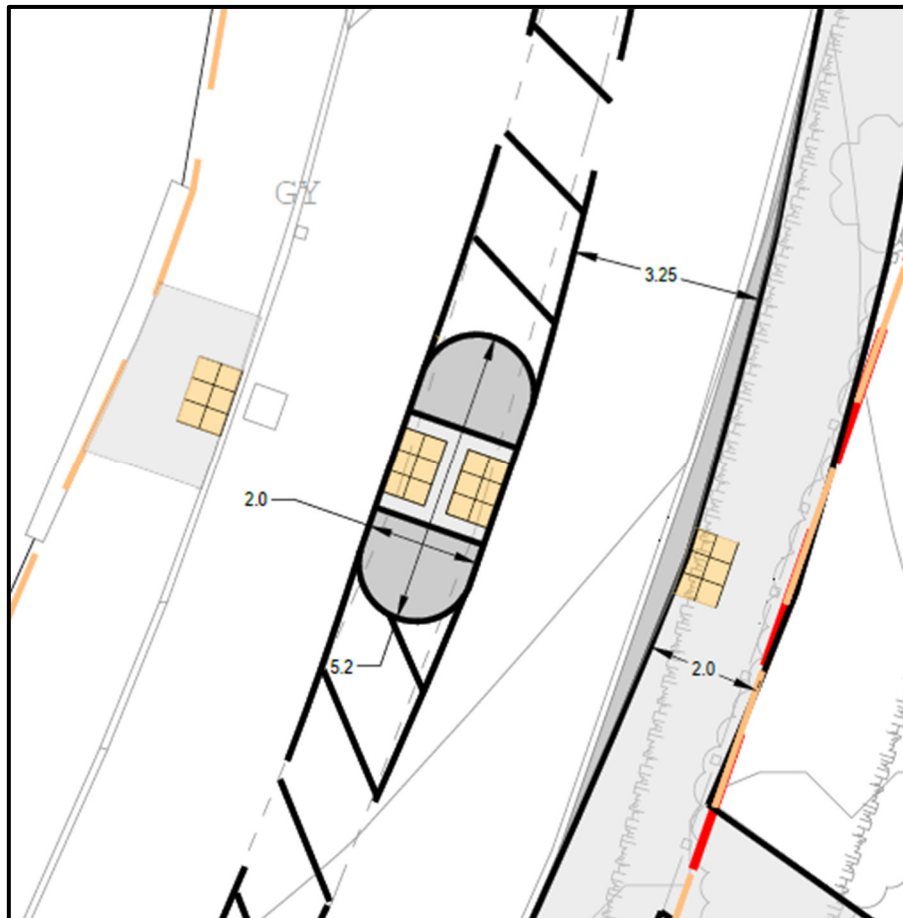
Proposed Crossing Facility – Northern Refuge Island
